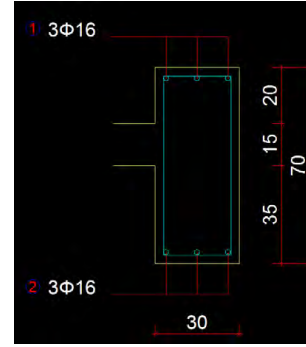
Beam Reinf. Plan of 4 St. Build.
